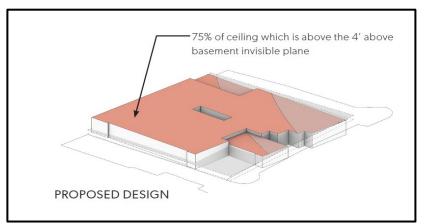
Proposed Parking Garage Ceiling Plane (Project Plans Page 46)
